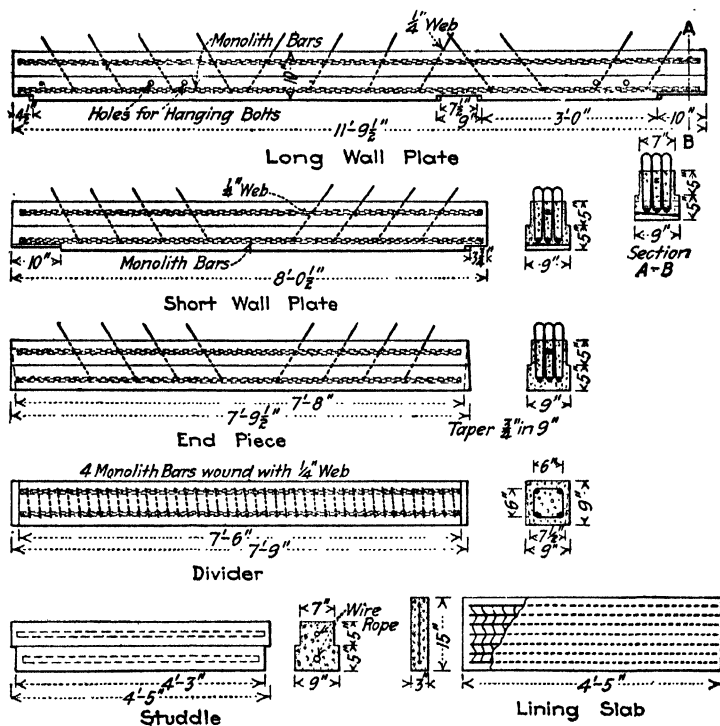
Reinforced-concrete sets or timbers for shaft lining.
